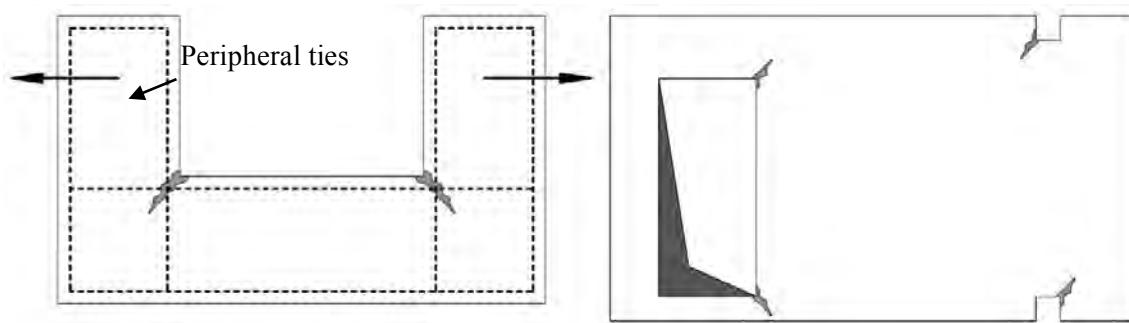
Re-entrant corners and holes in a diaphragm require special detailing of the tie layout
